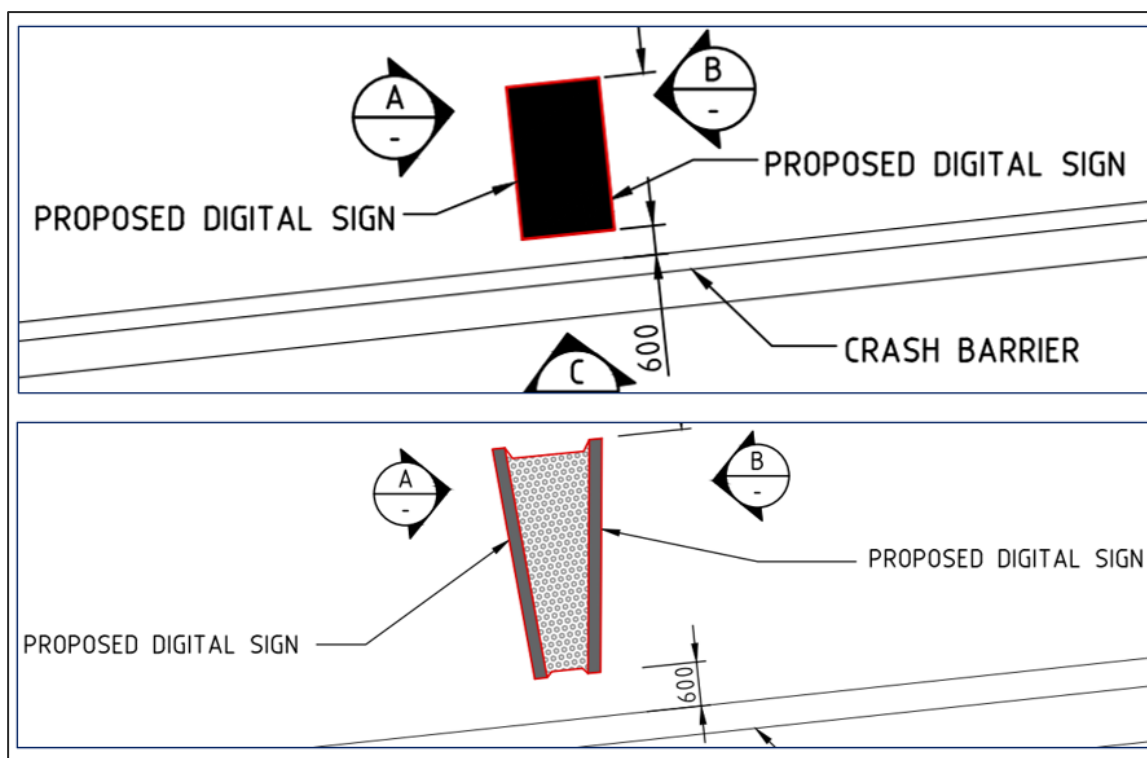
| Original proposed signage structure (above) compared to splayed signage structure (below) (Source: Architectural Plans and revised Architectural Plans)
